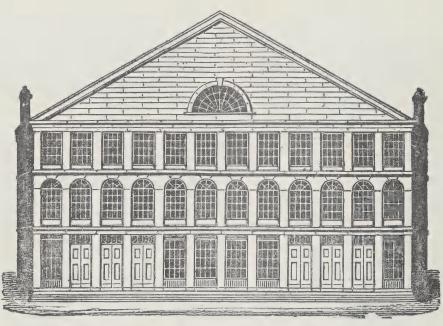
Woodcut elevation of the Mariner's Church, Fore Street, Portland, Maine, designed and built by an unidentified architect in 1828–1829.
